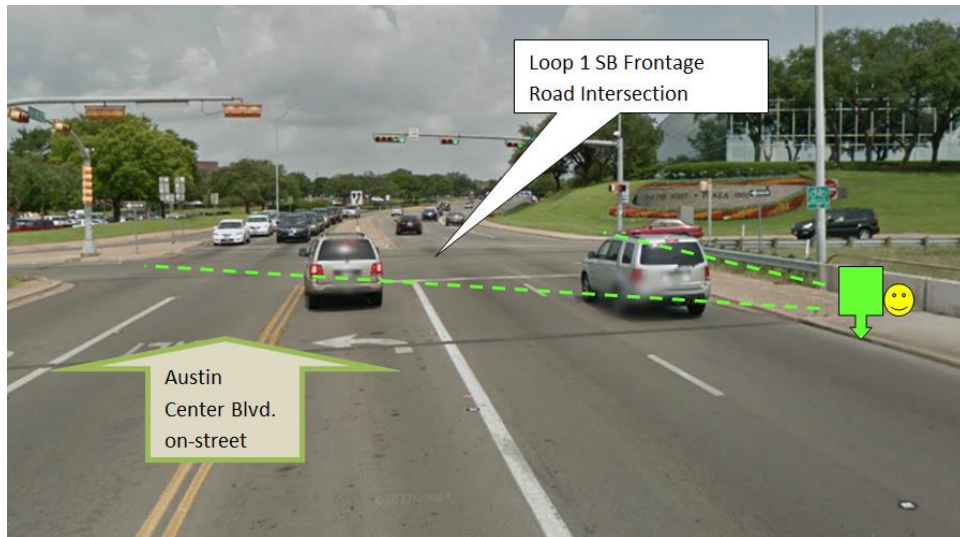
, 5.4, and 5.5 show the locations of the cameras on the bridge, as well as the locations of the camera operators. The cameras depicted in green were aimed at the intersections, and the cameras depicted in red were aimed at the freeway.
